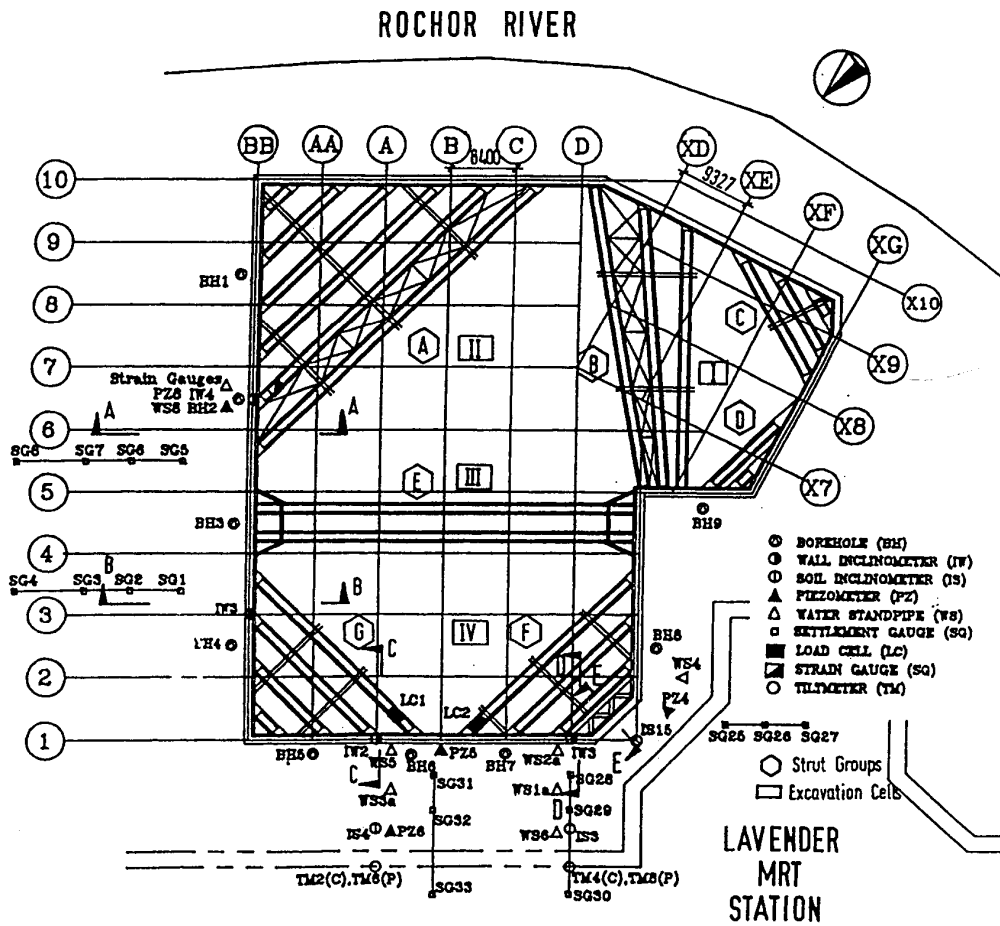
Plan View of IMM Building Excavation (by Lee, Yong, Quan and Chee (1998))
